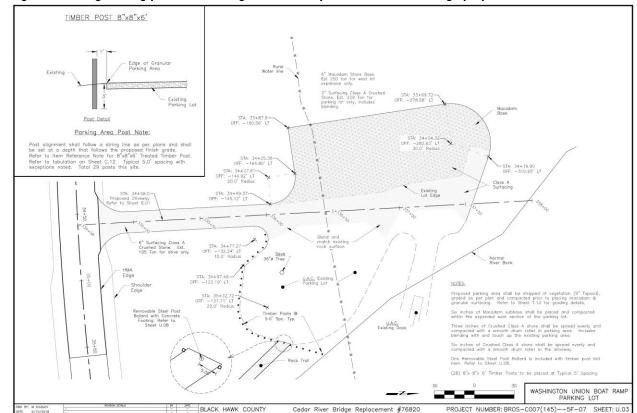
Engineering plan for Washington Union as part of 2019-2020 bridge project
